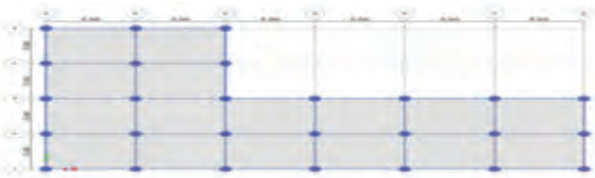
Structural Plan of G+15 L-Shaped Building with Circular columns
